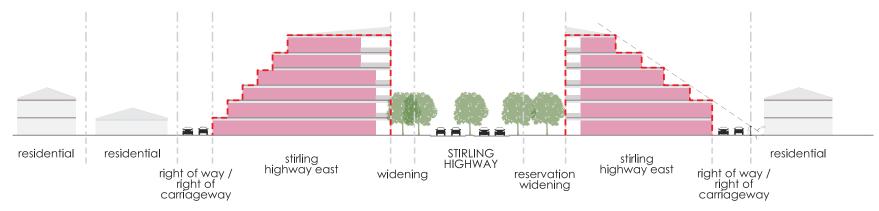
Cross Section A-A shown spatially on Figure 12, outlining the potential built form envelope for new development within the Stirling Highway East Urban Corridor Planning Area.
